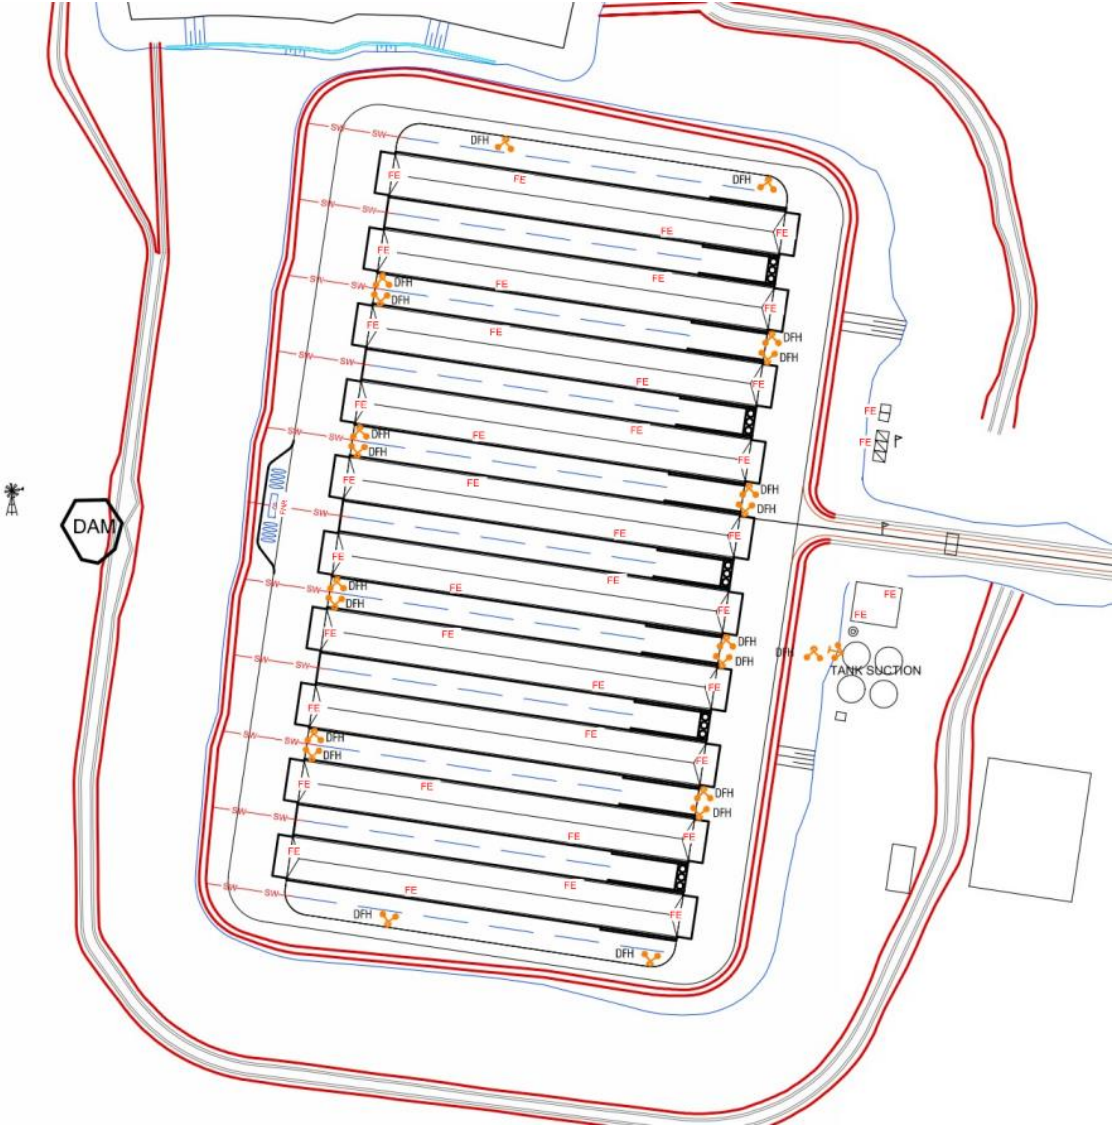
Farm 1 – Fire hydrant and fire extinguisher layout
